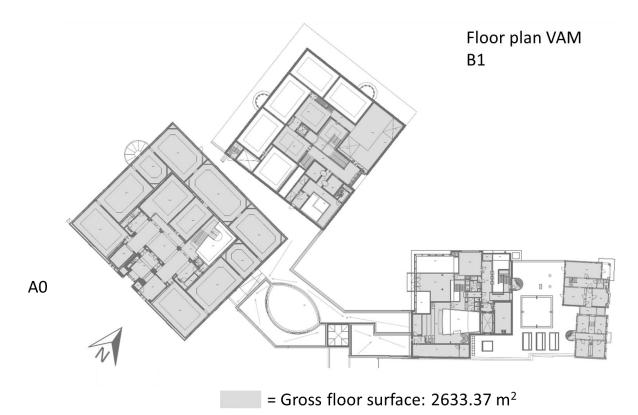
Floor plan A0 and B1, floor plan under layer by Cahen (2003).
